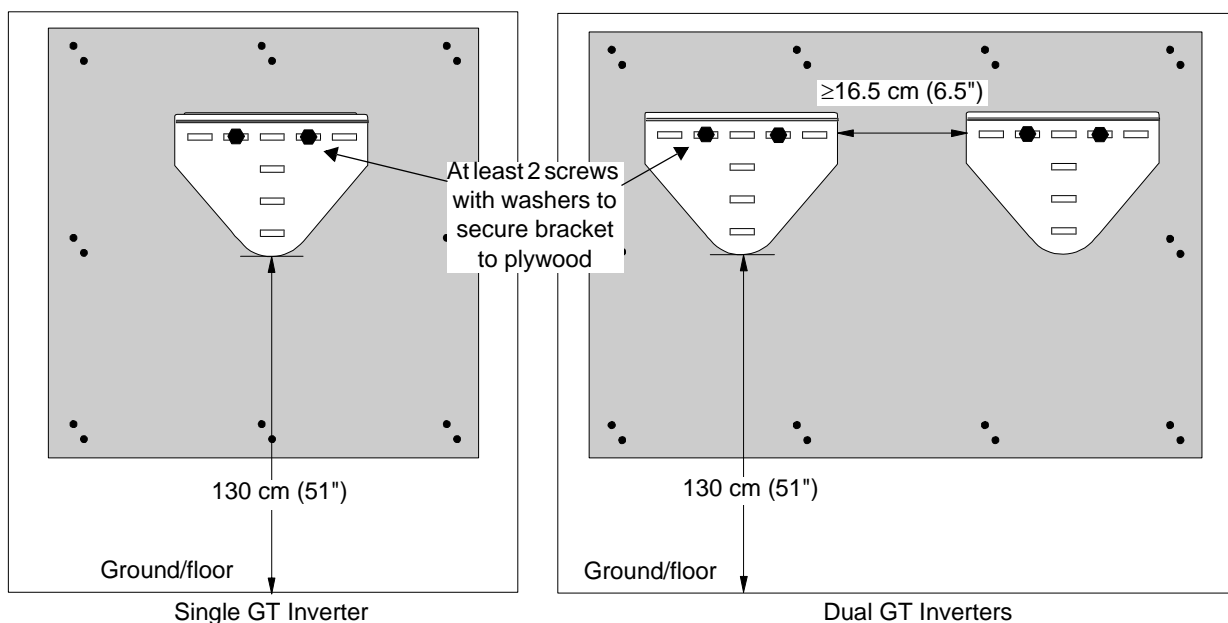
Installing the Mounting Bracket using Plywood Support
